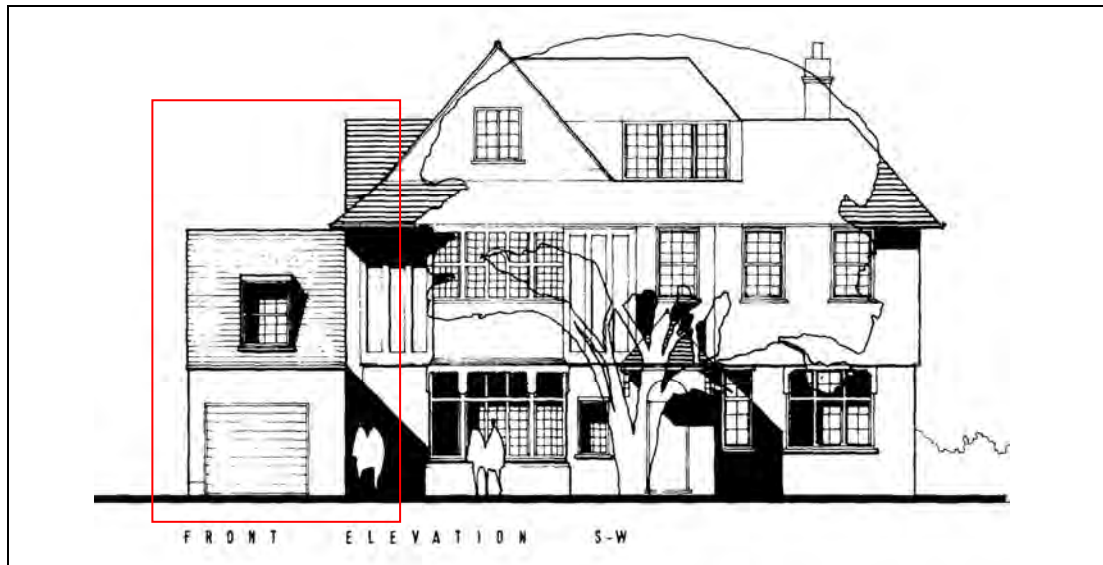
No. 64 Elsworthy Road 1986 – Ref: PL/8501942
